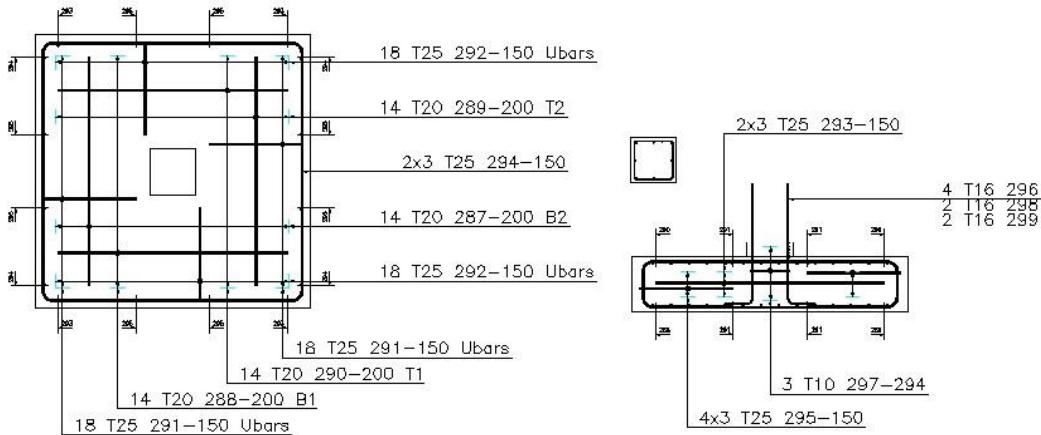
1 Typical Pad Base Reinforcement Detail
